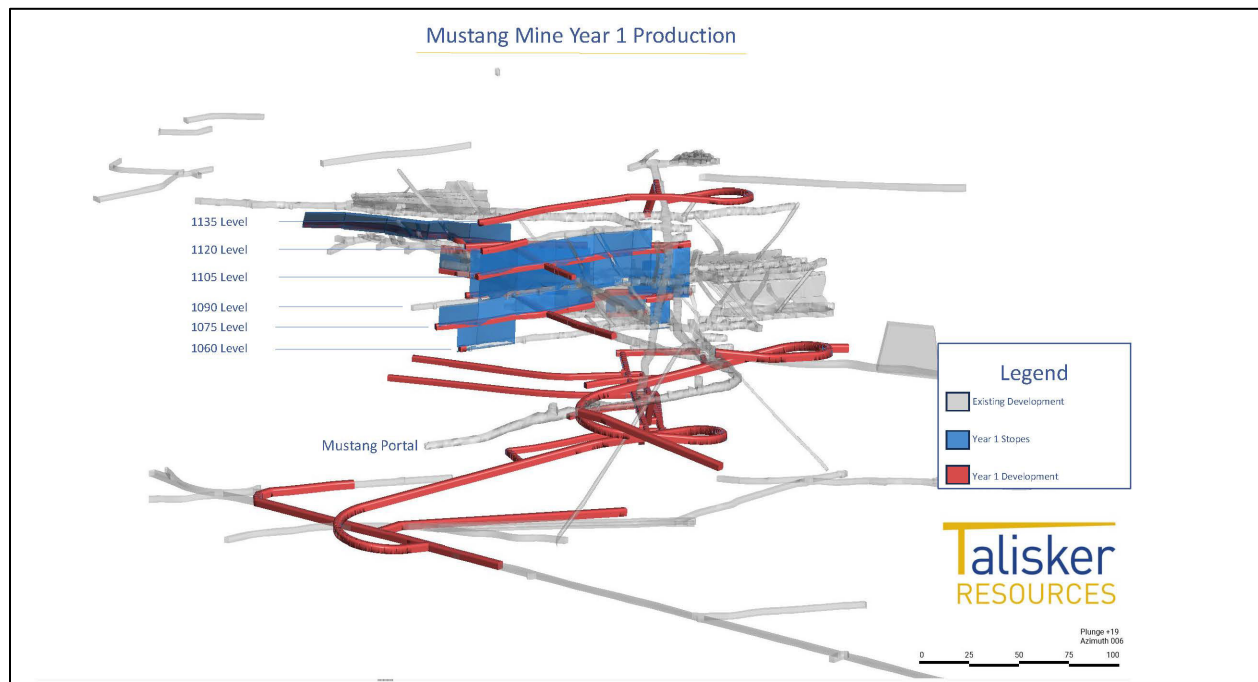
Long section view of Mustang Mine production plan between March 2025 and March 2026.
